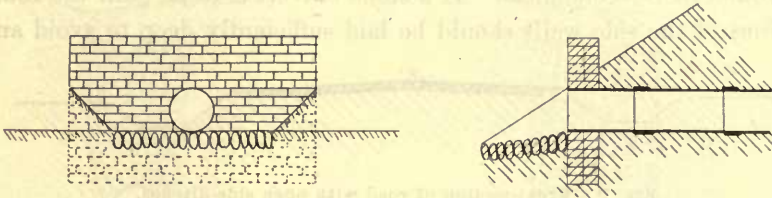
End elevation and longitudinal section of a pipe culvert under an embankment.
